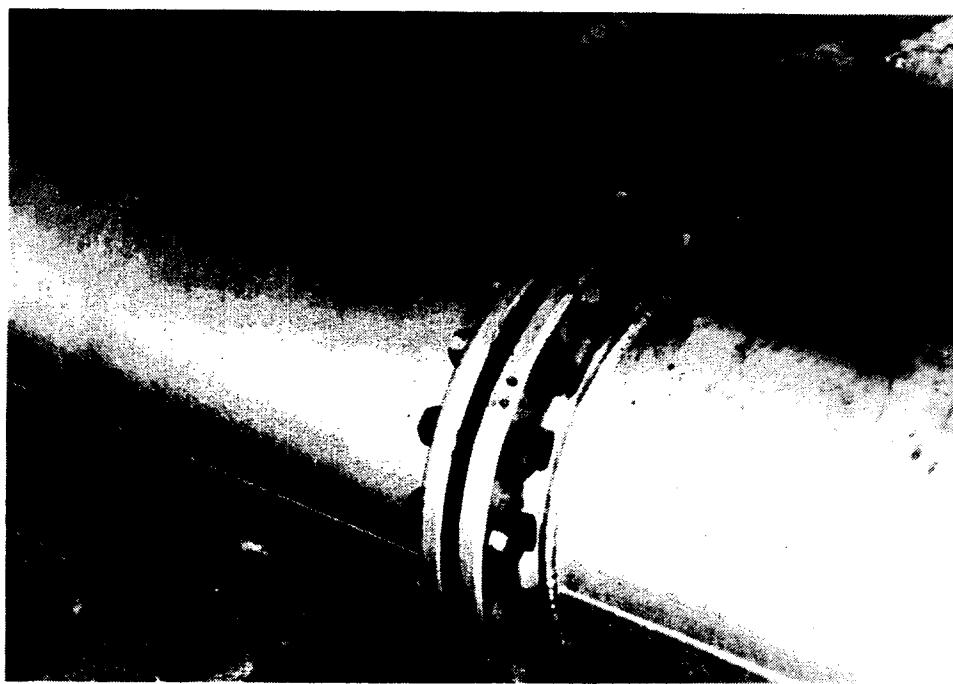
Back-Pressure Plate, Installed (Ref. 1)
